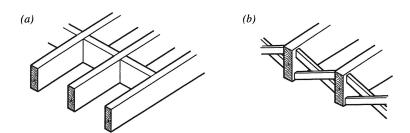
Strutting between floor joists will increase the transverse stiffness of a floor. (a) Solid bridging, (b) herringbone strutting.
